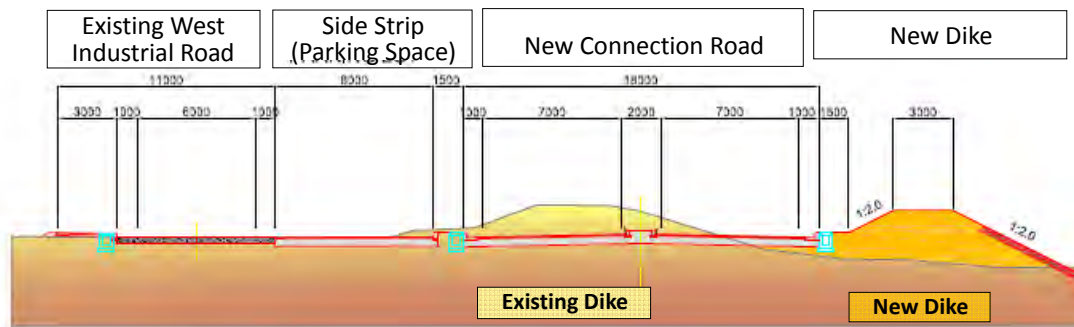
(b) Typical Cross Section of West Industry Road
